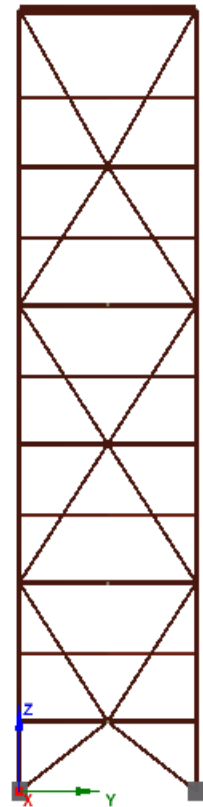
Side Elevation View (Axes A-B) of 10-Storey frame [12]
